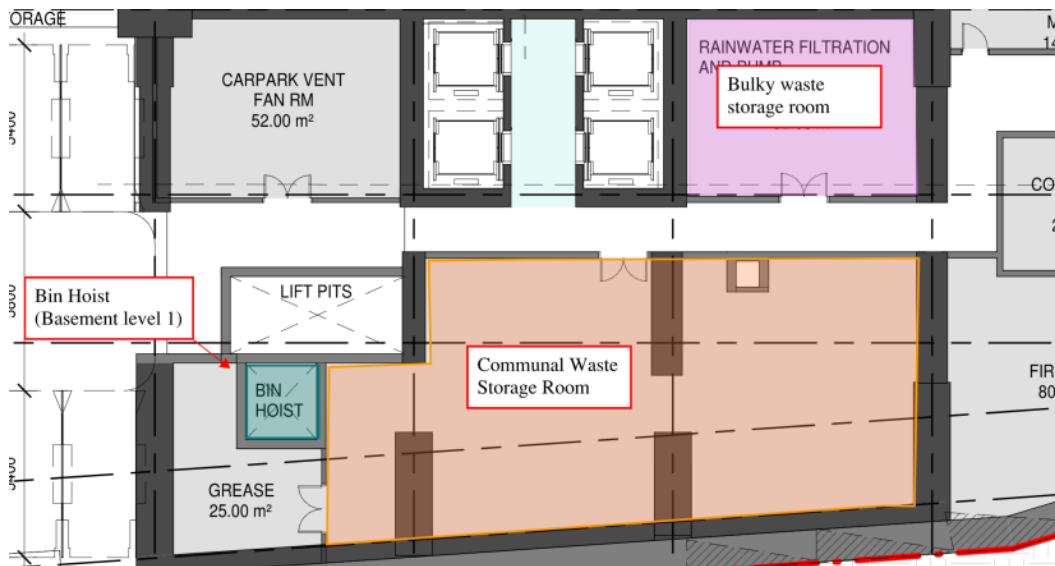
Residential waste storage room and bin hoist - Basement level 1 (highlighted areas are not to scale and are high level areas to indicate zones)
